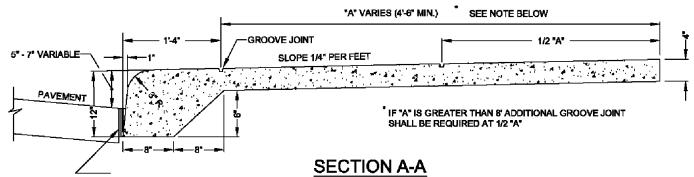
## DETAILS SHOWING EXPANSION JOINTS FOR CONCRETE SIDEWALK
